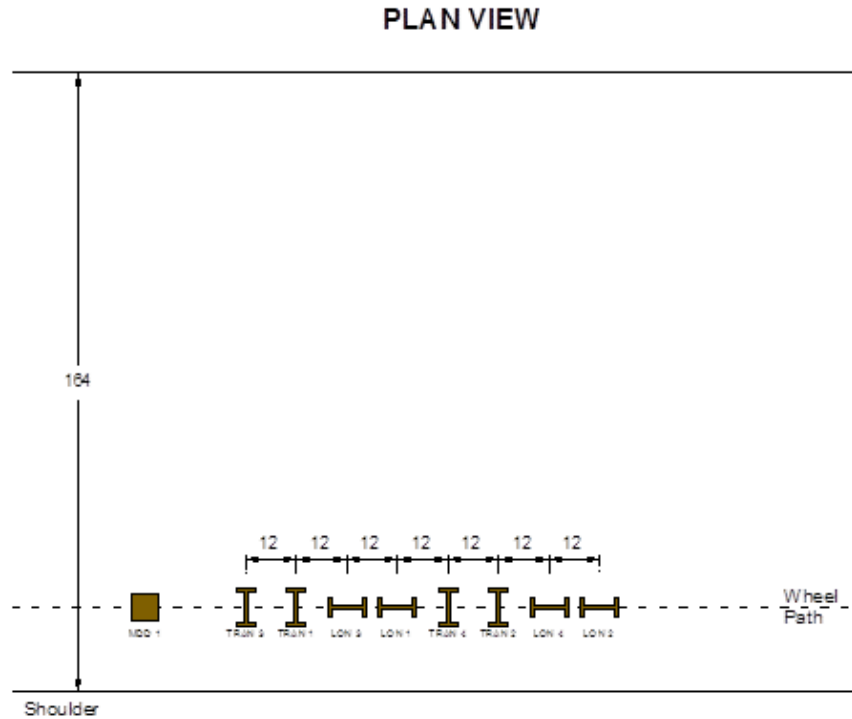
Illustration. Plan view of pavement structure and instrumentation for the 50%-RAP-AC test section at UC-Davis.
